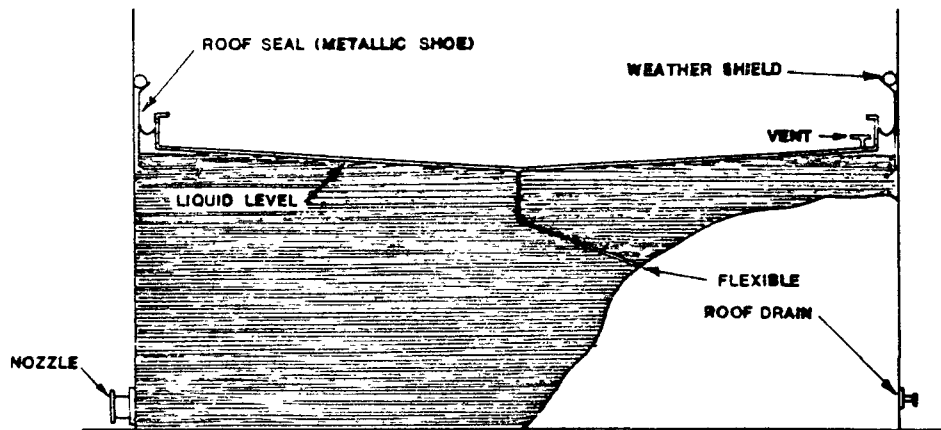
Pan-type floating roof storage tank (metallic seals).
